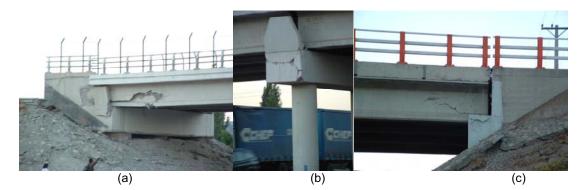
Damage at shear keys and web of beams (a) wall shear key at abutment, (b) tall shear key at central pier, (c) short shear key at abutment. All photographs were taken at Ruta 5 Highway
